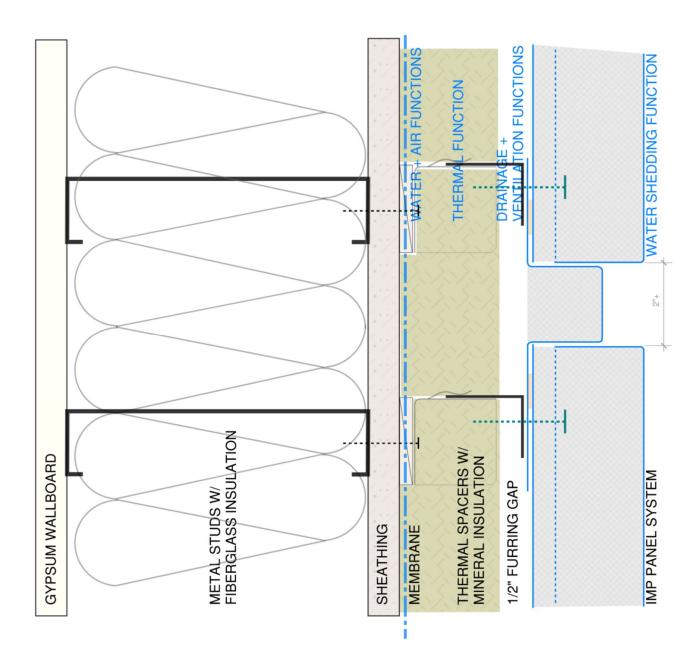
Assembly A – IMP Custom Fit, furring, membrane / sheathing
